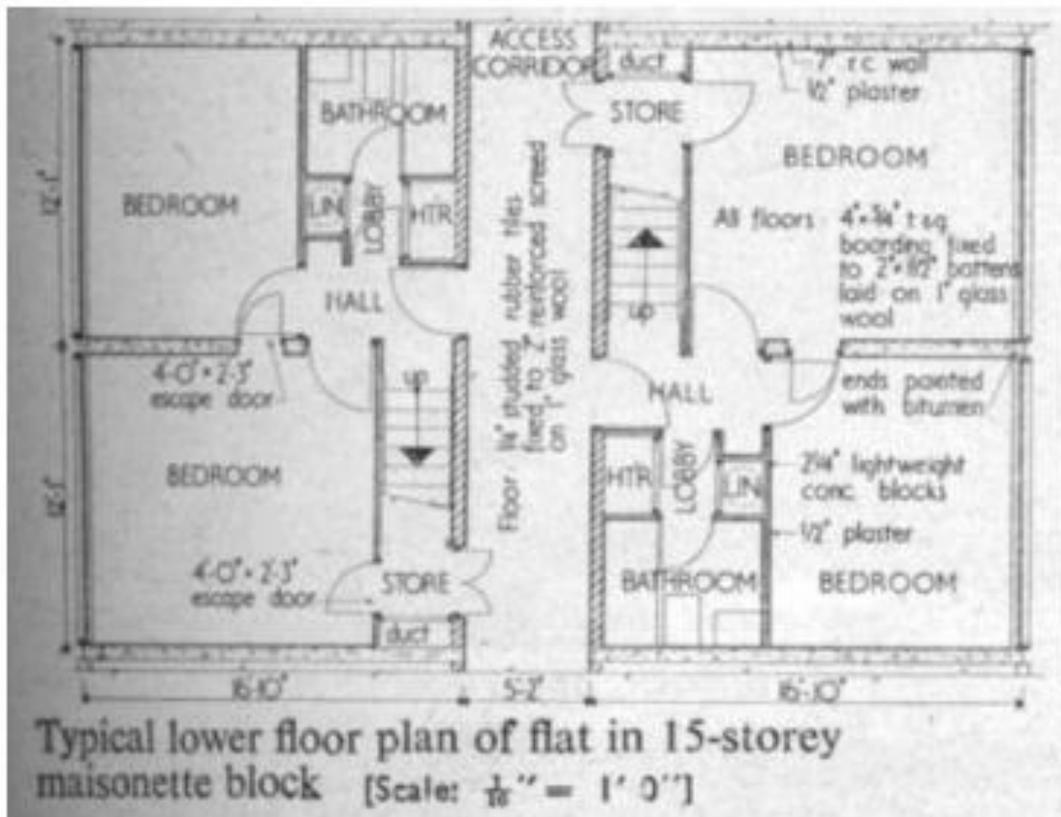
Architects Journal – Typical maisonette lower floor plan layout. Source: <https://www.architectsjournal.co.uk/news/sceaux-gardens-camberwell-the-original-1960-aj-building-study>
